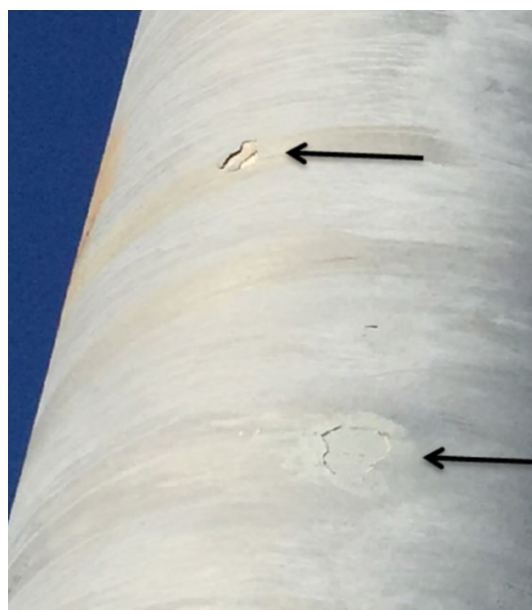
Cantilever or truss structure vertical supports, galvanizing damage
